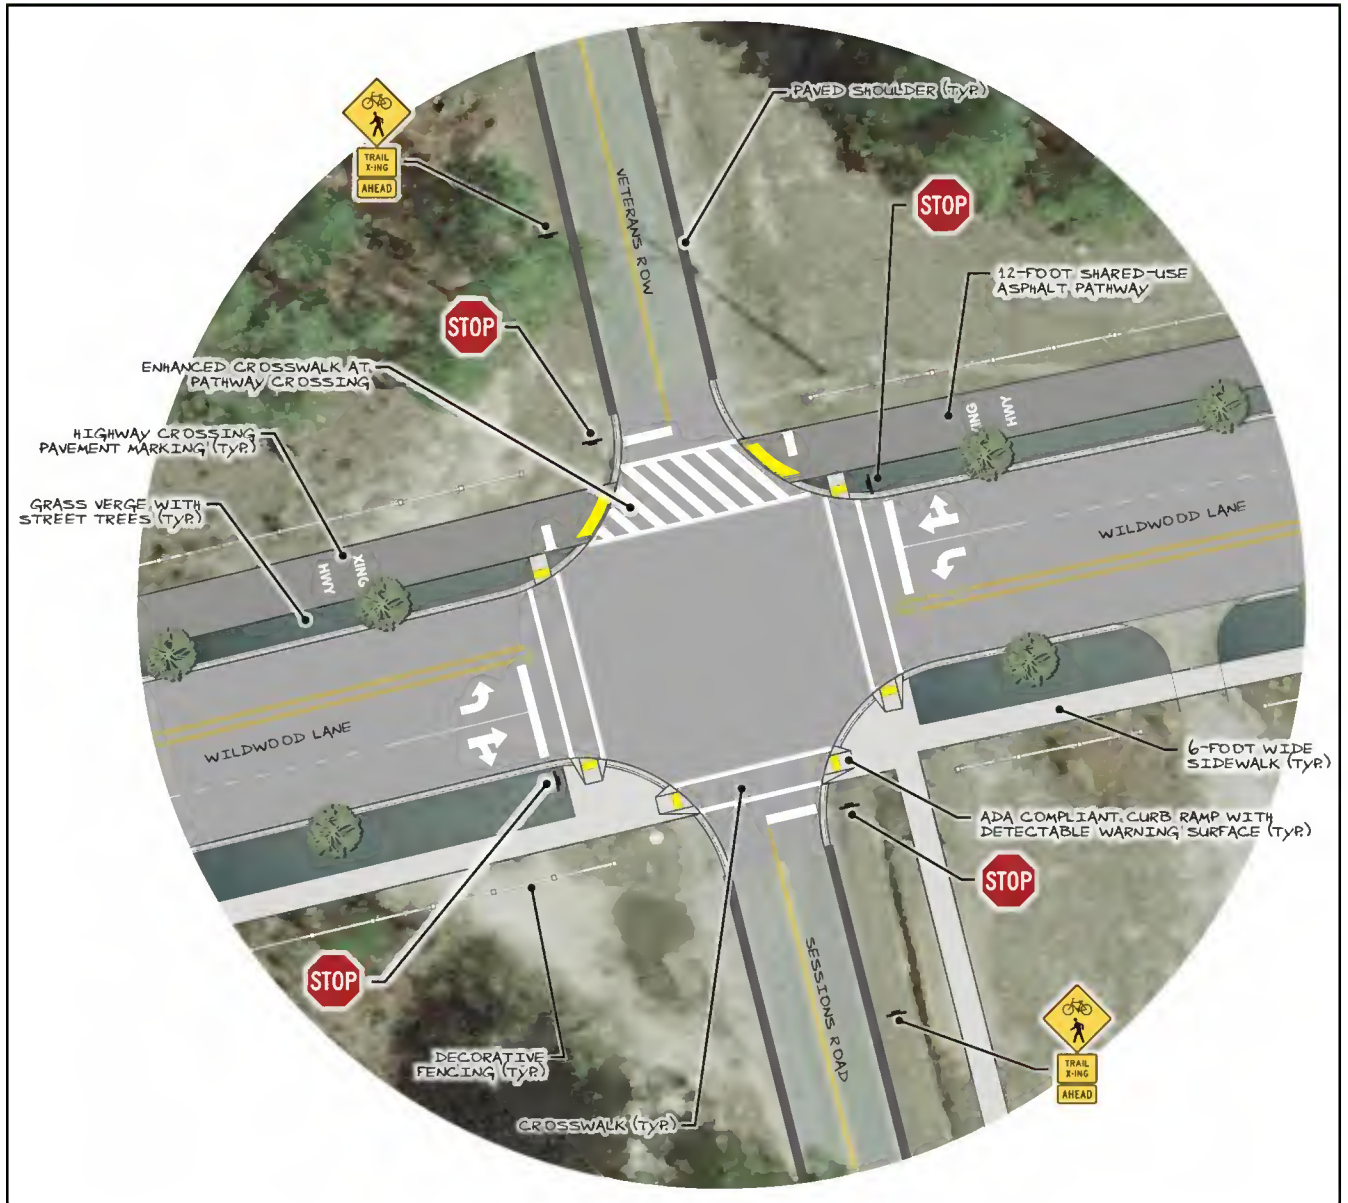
Wildwood Lane/Sessions Road/Veterans Row Intersection Schematic Design
